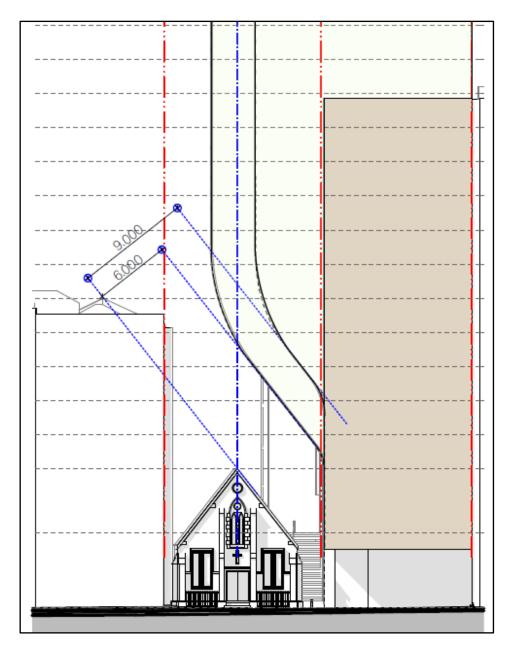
Kent Street elevation and the extent of the modulated cantilever as originally proposed.
